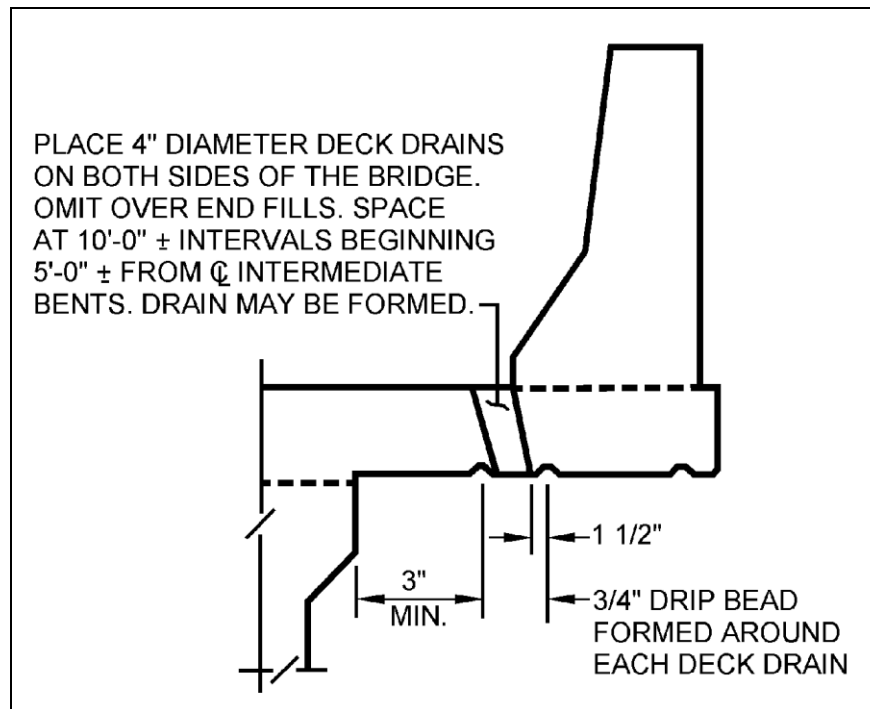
Four-inch diameter deck drain detail at barrier.
